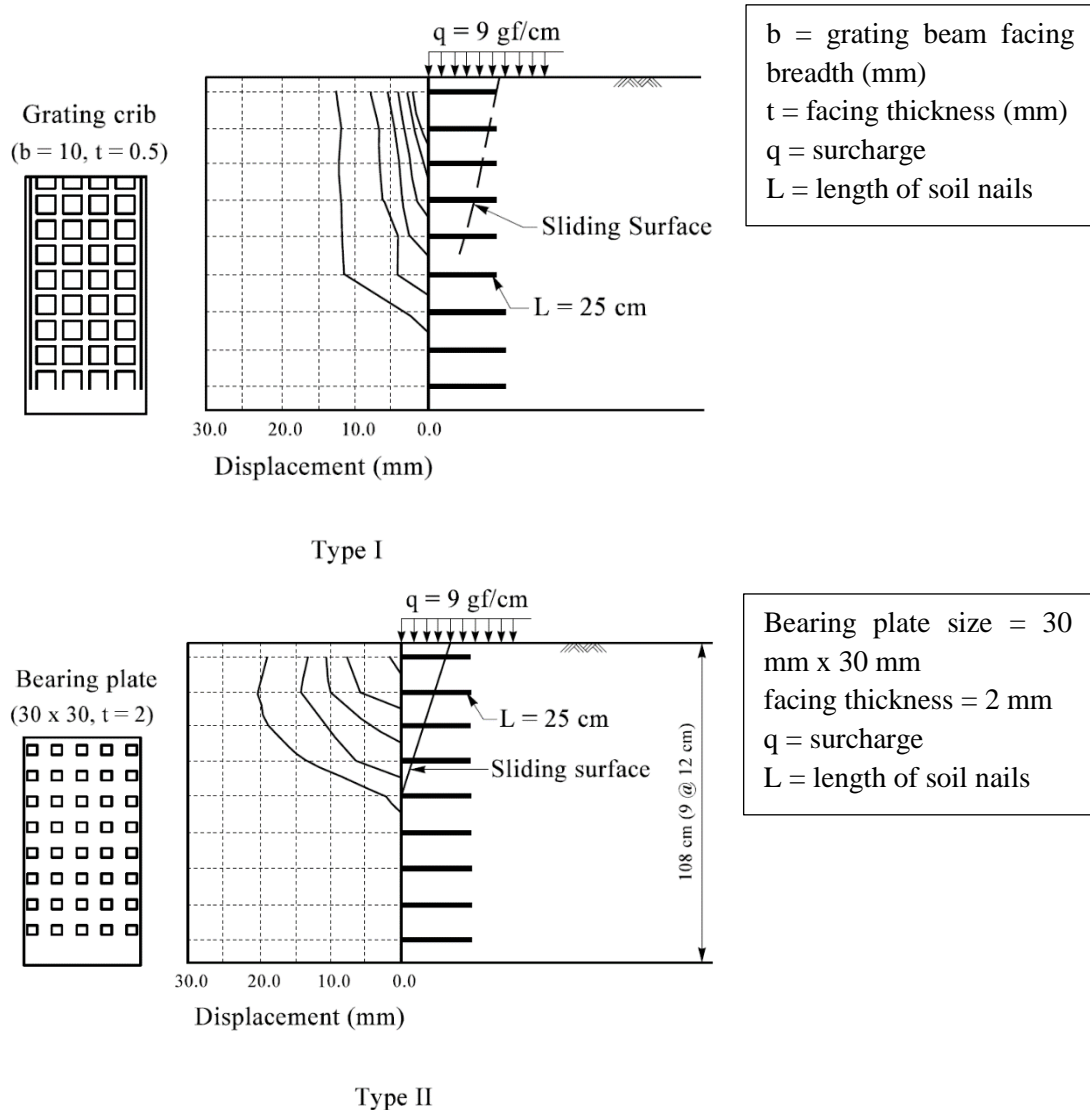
Slope Facing Types and Reinforced Slope Deformation Modes (after Muramatsu et al, 1992)
